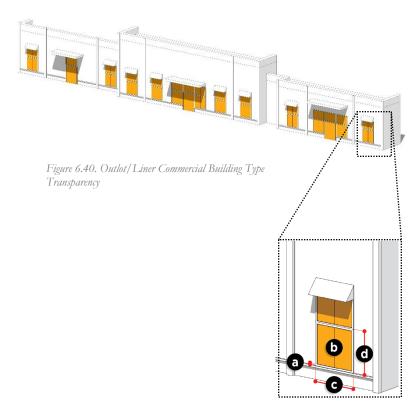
Outlot/Liner Commercial Building Type Window Dimensions
